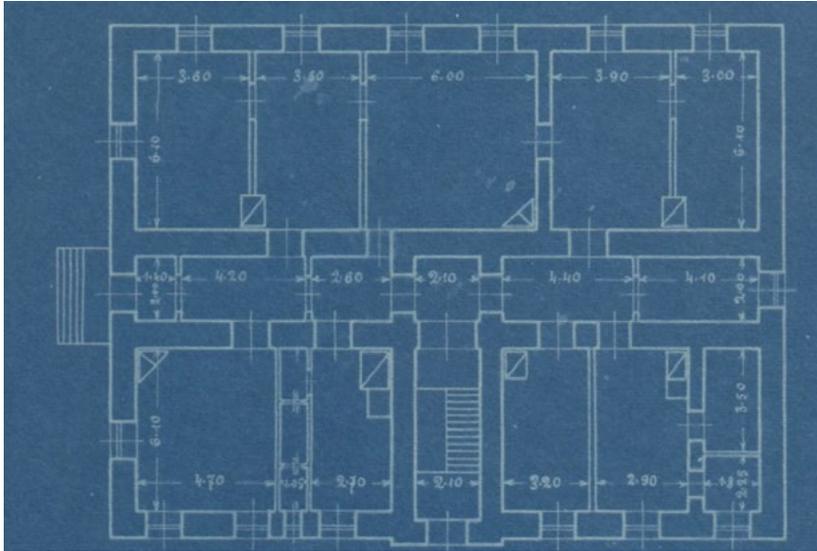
Ground floor plan of the administrative building, 1918, APL, C. and K. District Headquarters in Lublin. sign. 411, p. 8
